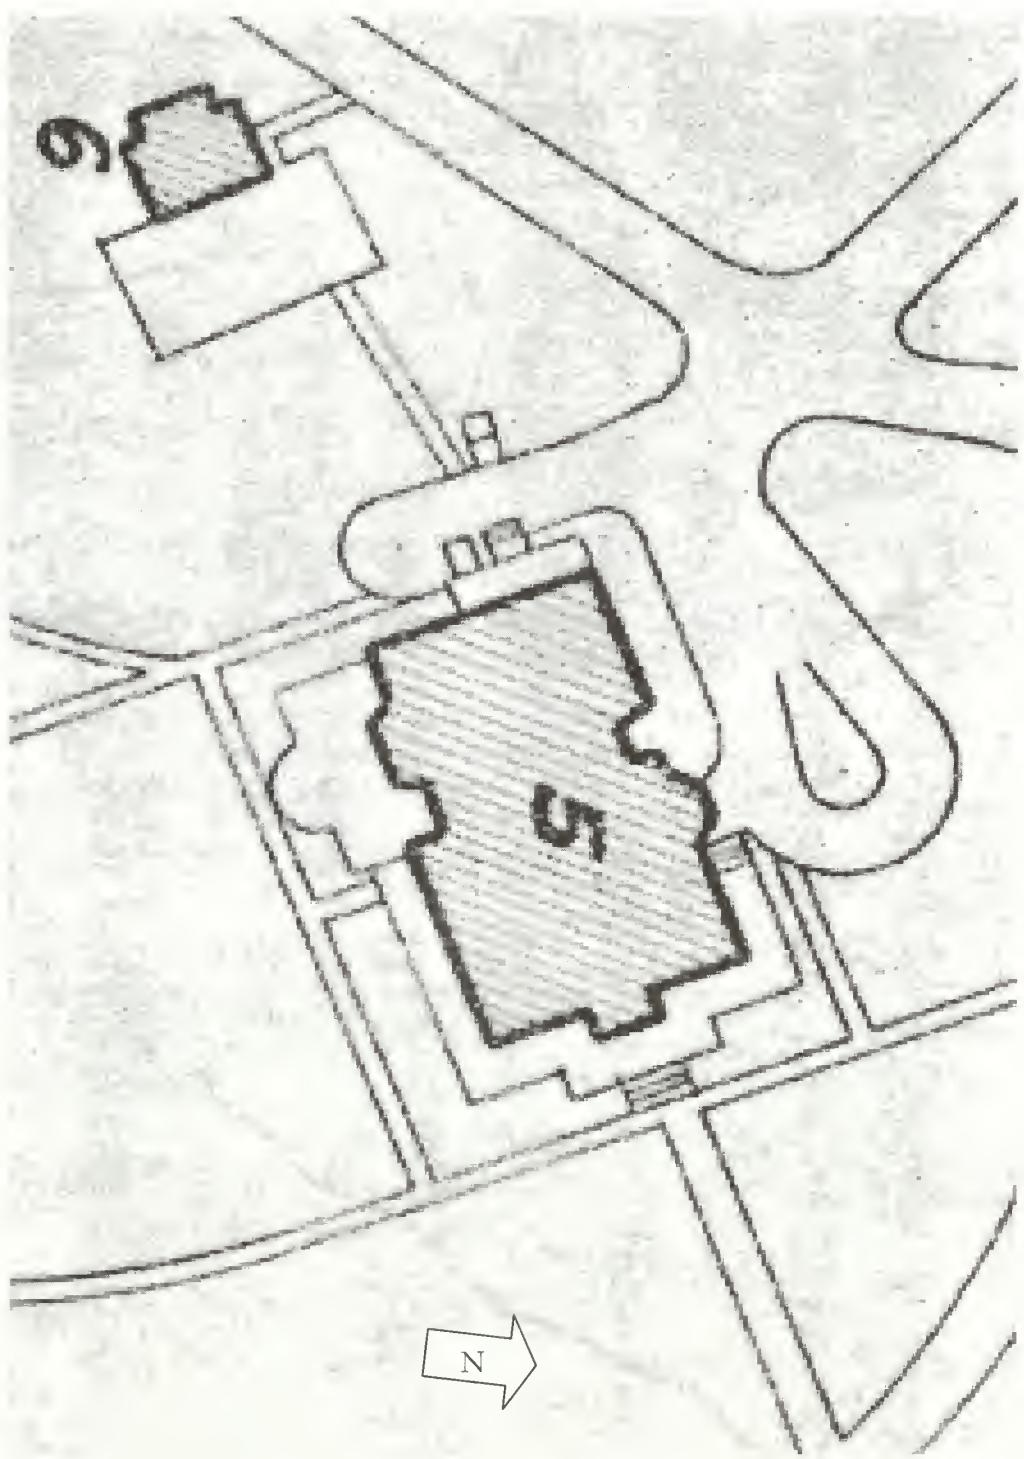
Detail of map of Sandy Hook Proving Ground, 1908/1915, showing Officers Club "footprint" with ca.- 1905 additions, including bay window and rounded porch on south elevation. Map also shows Laundry/Building No. 113 (No. 6).
